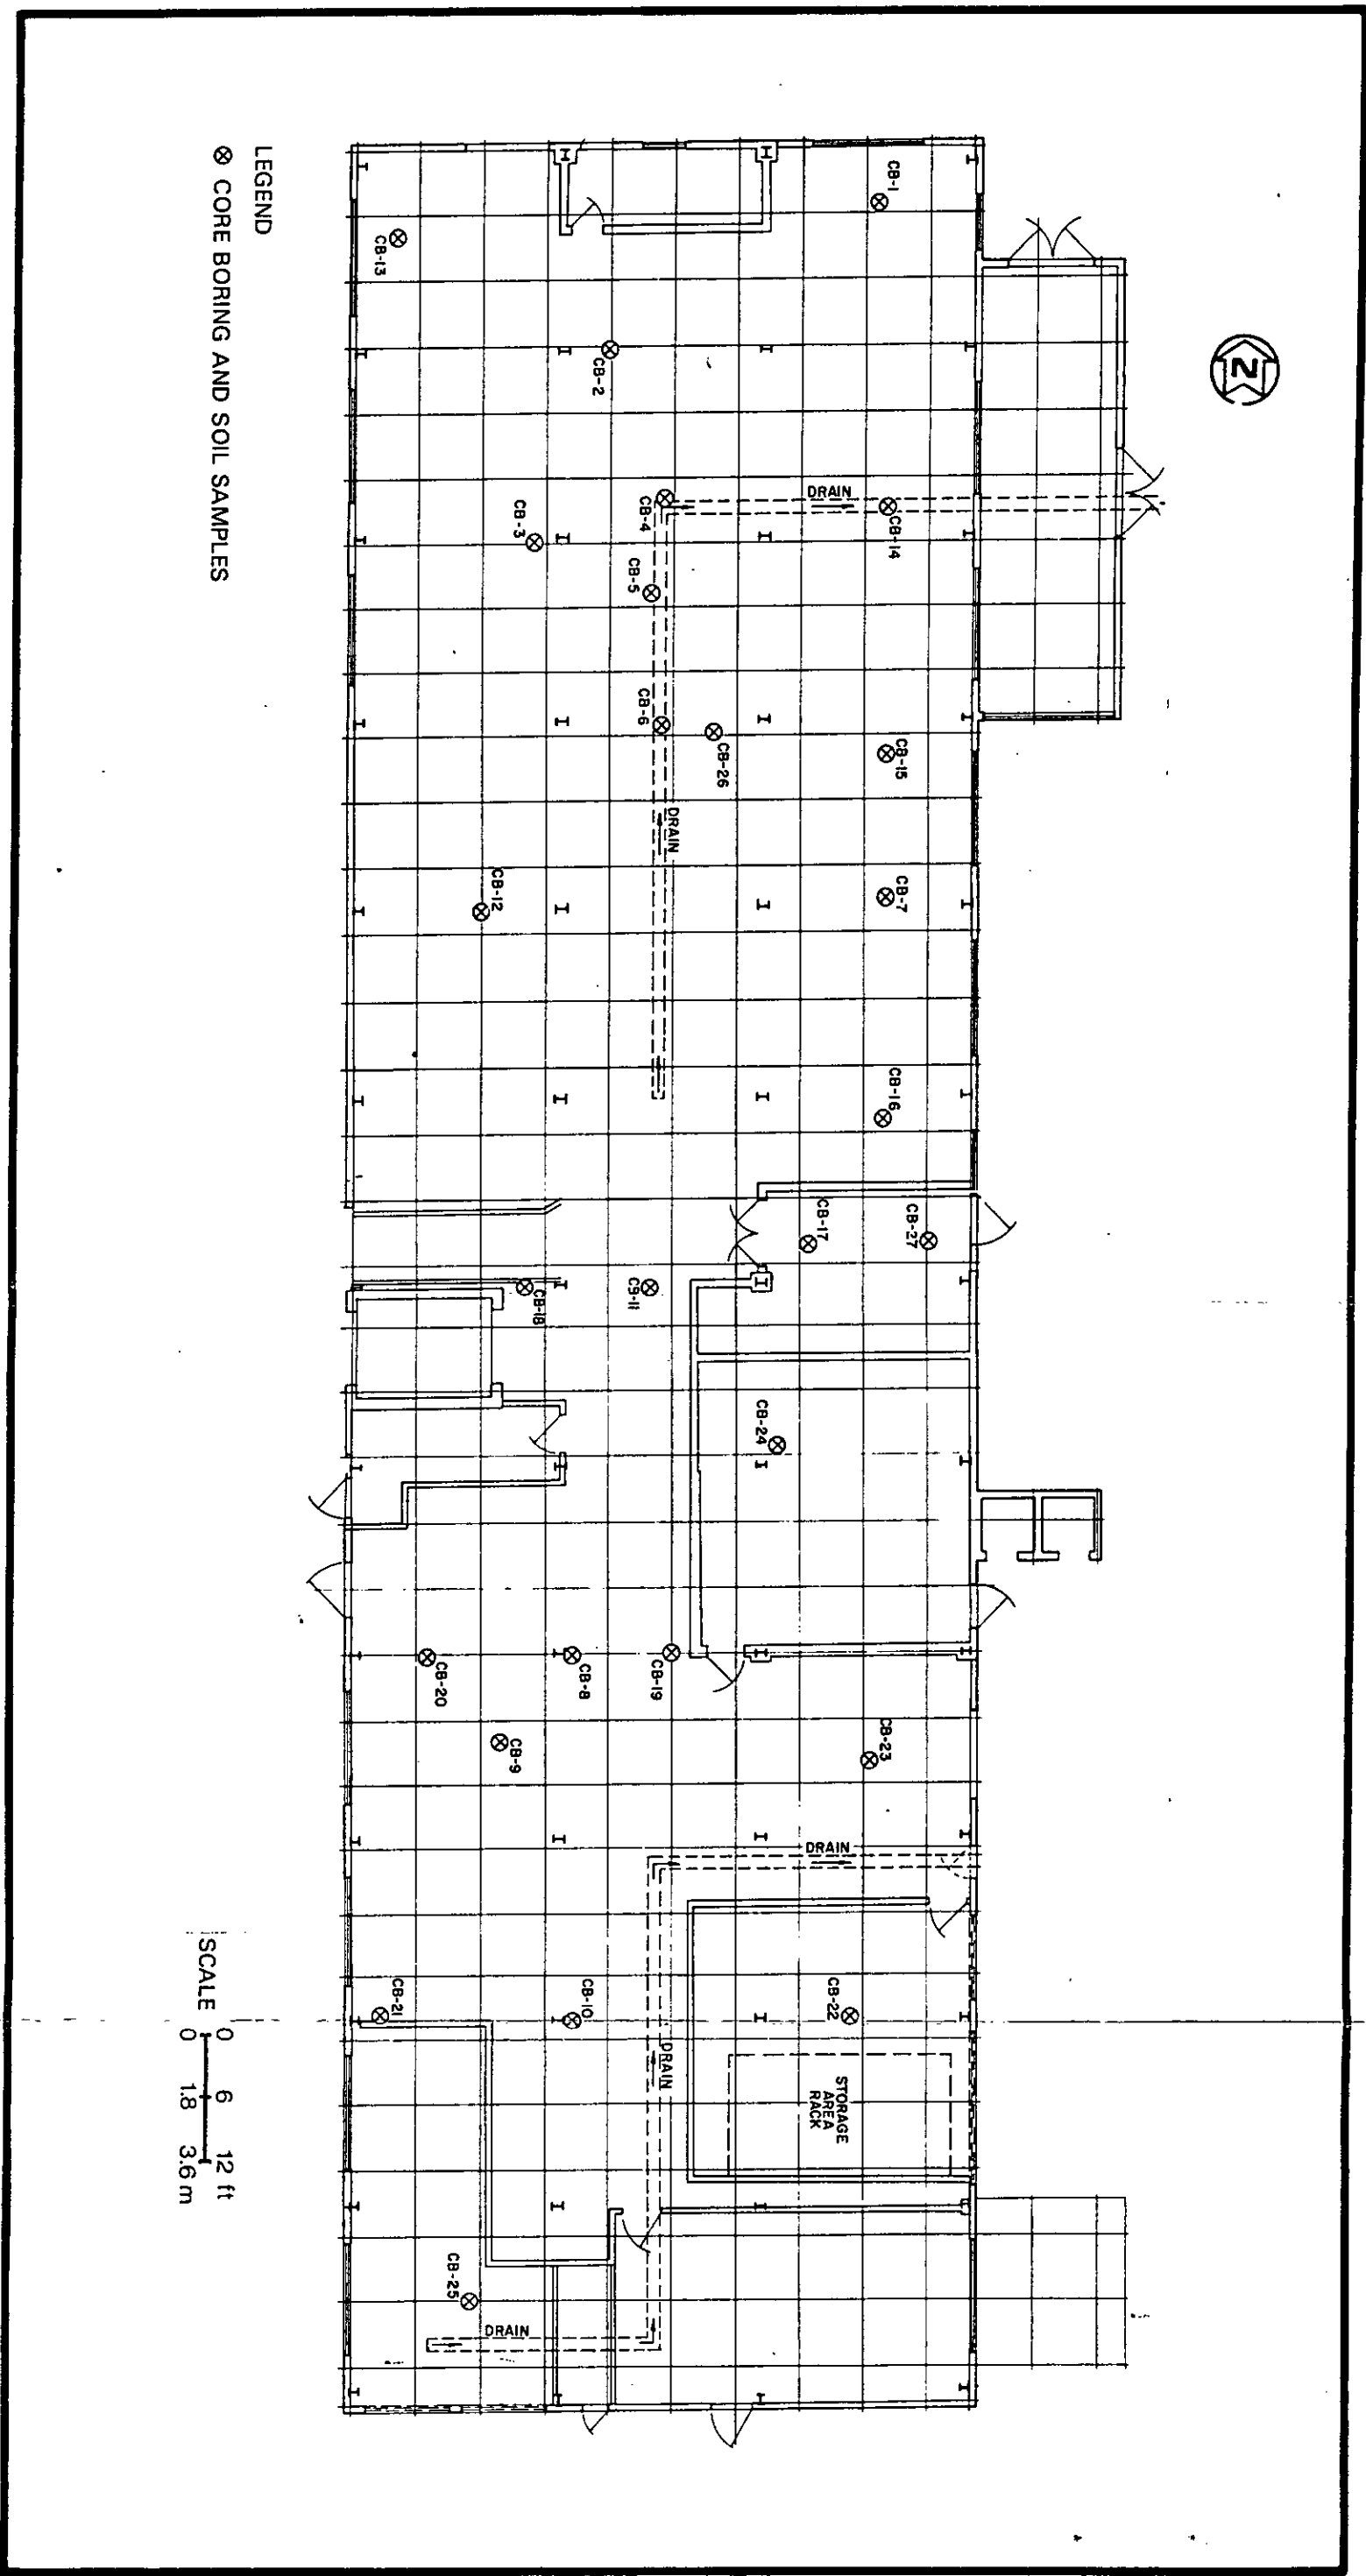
CORE BORINGS AND SOIL SAMPLE LOCATIONS, BUILDING 845 (GROUND FLOOR)
